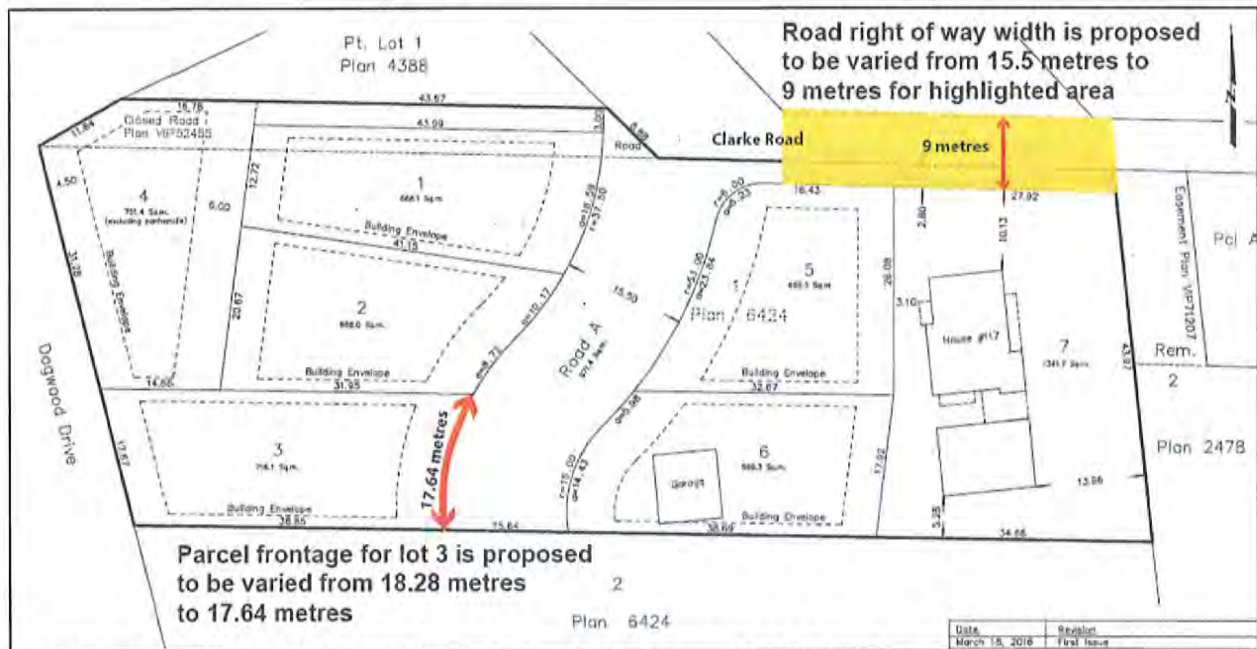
Subdivision Plan and Two Proposed Variances for 117 Clarke Road
